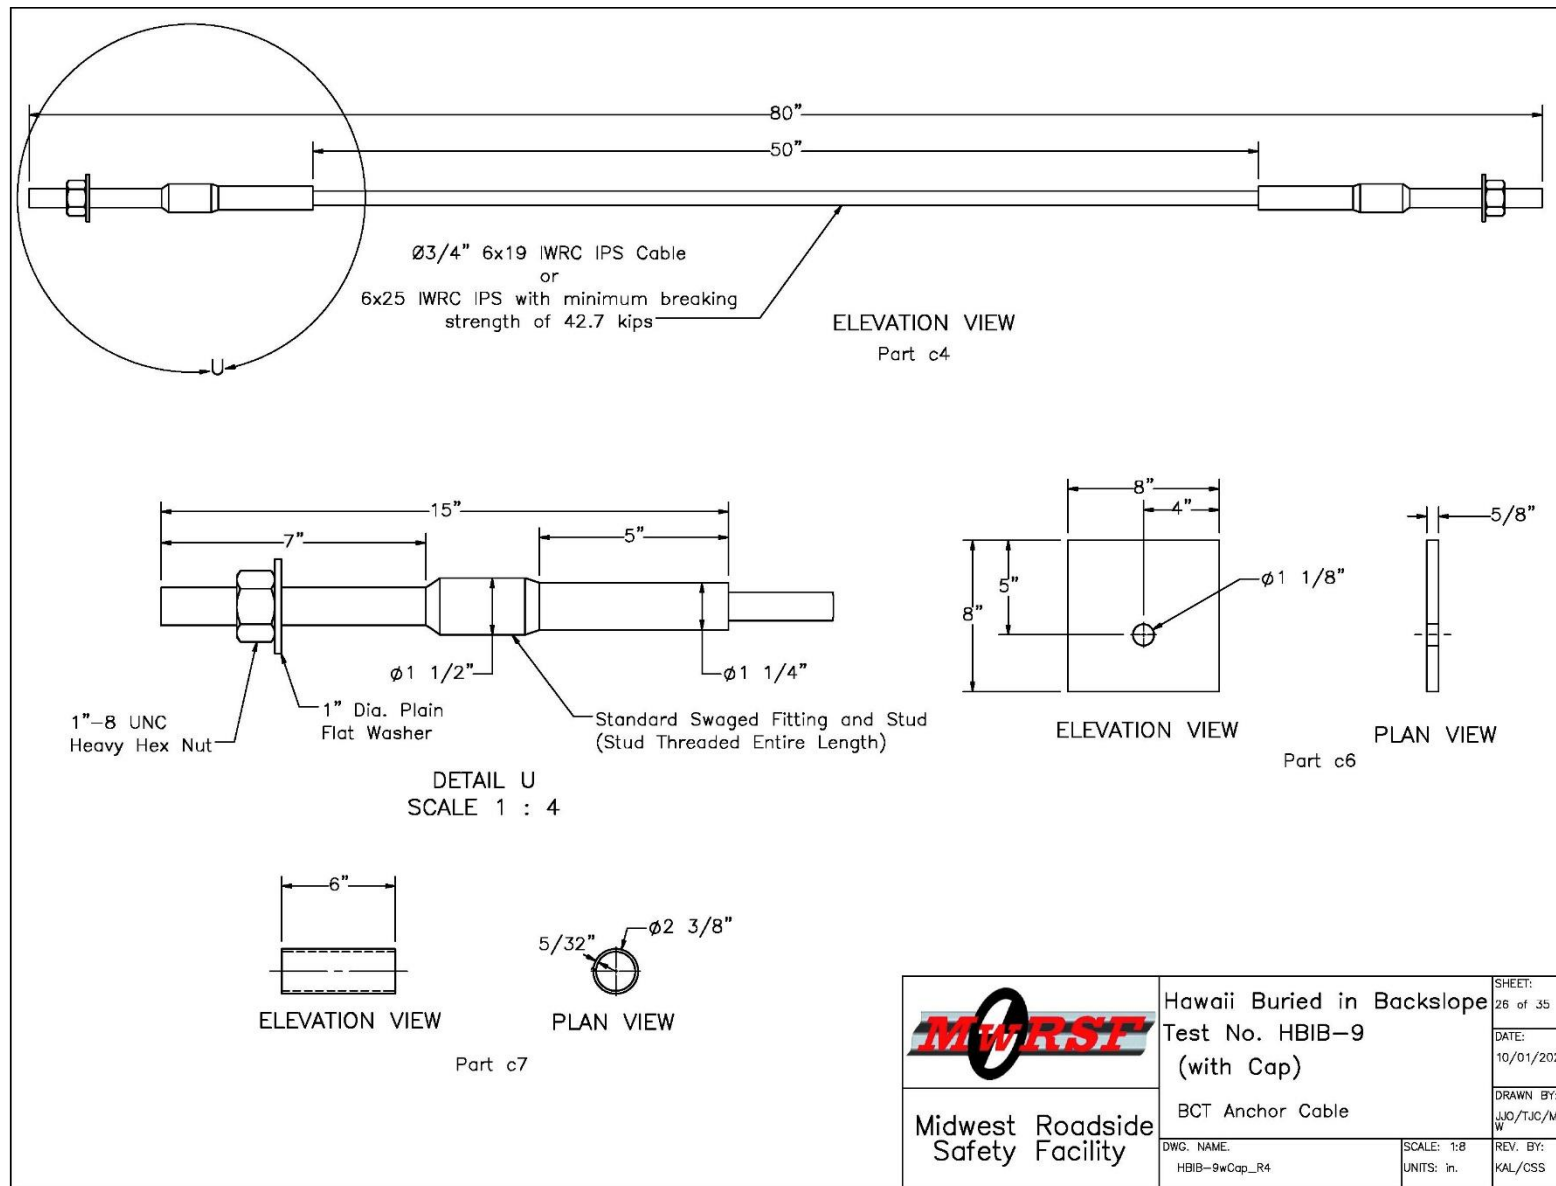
BCT Anchor Cable, Test No. HBIB-9
